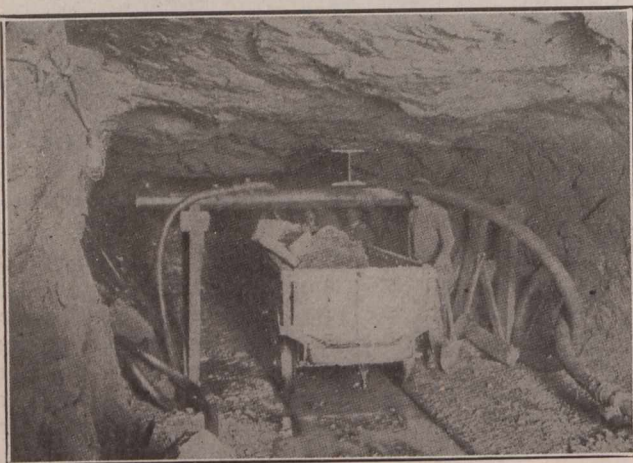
Heading Excavation, Rear End of Cantilever Beam of Drill Carriage Without Conveyer.
